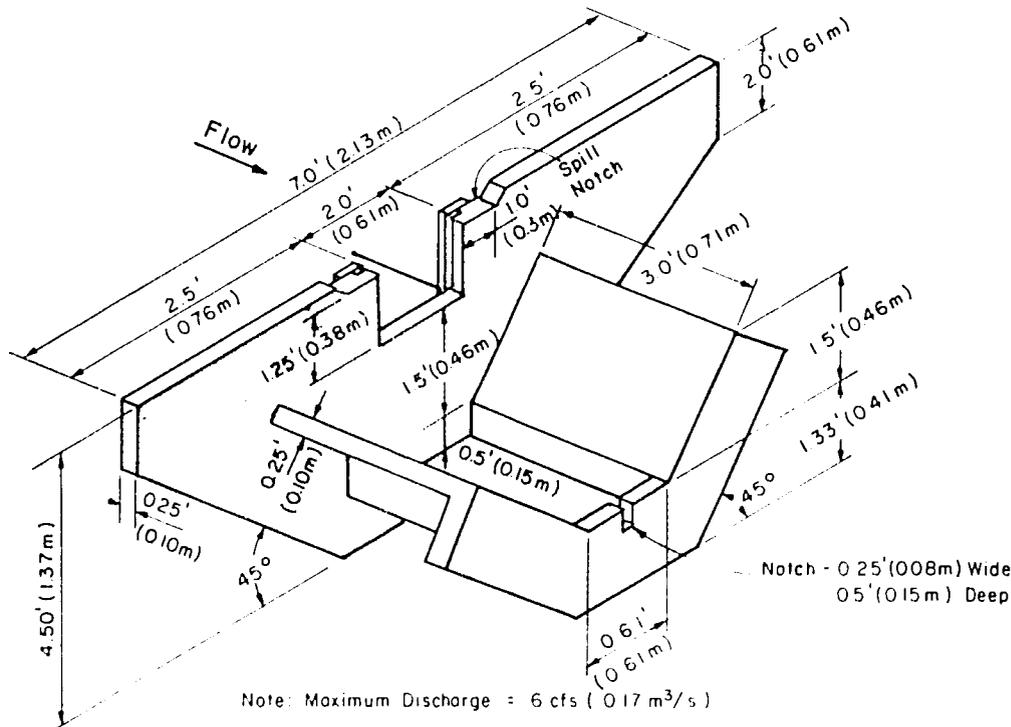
Concrete drop-check (21, 33). Optional sidewalls are shown (SCS Photo).
